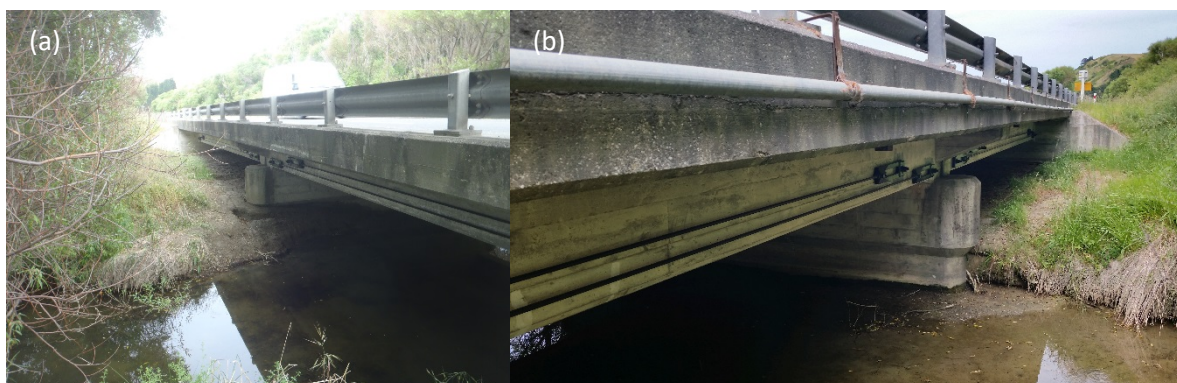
a) Tirohanga Bridge deck and pier, looking south, b) pier and abutment pre earthquake, looking north
